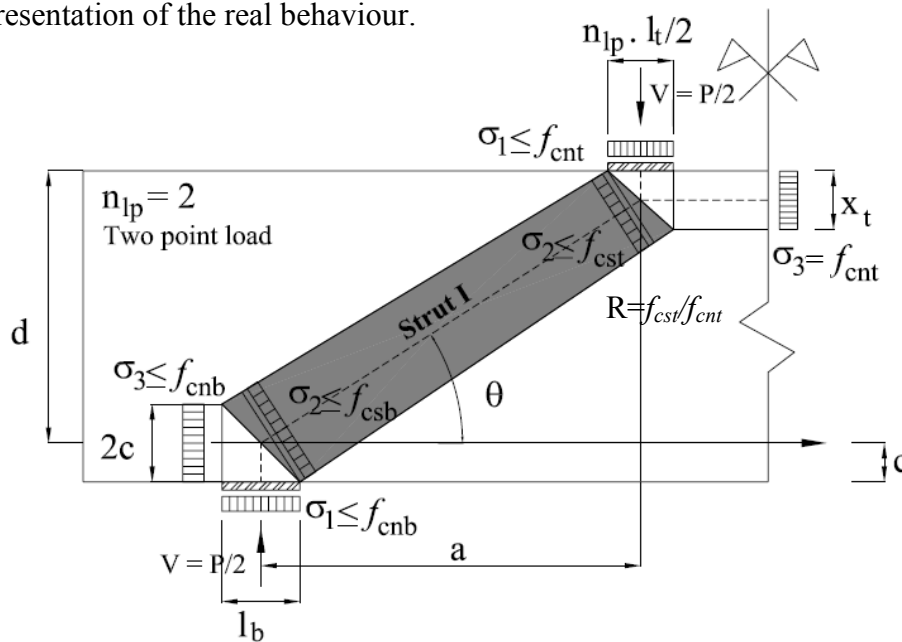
Strut-and-tie model for a short span beam without stirrups
